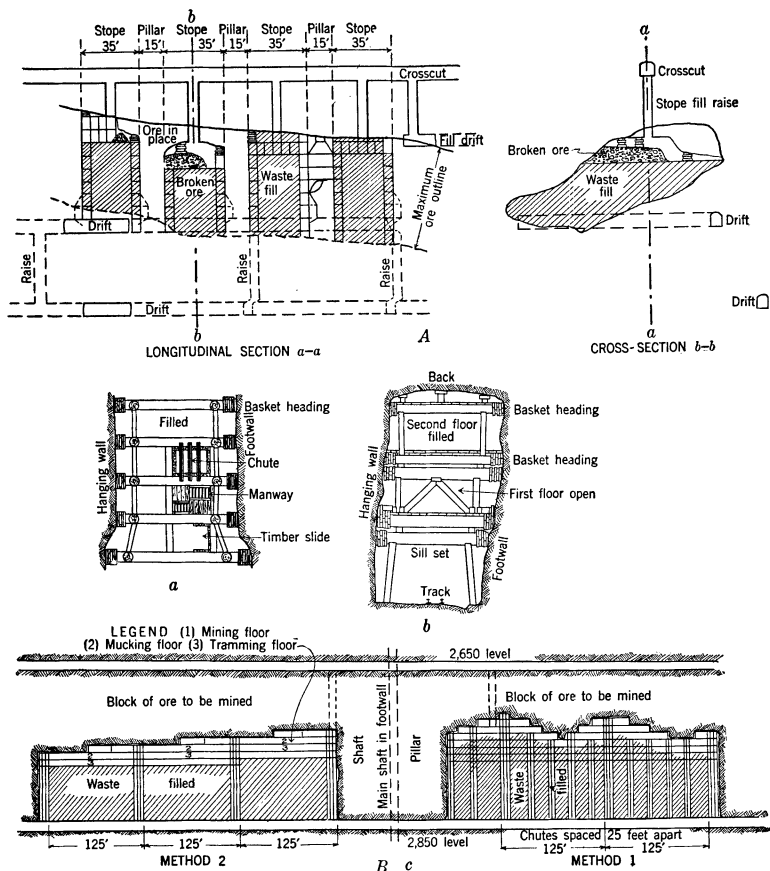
A, Cut-and-fill stoping, employing alternate stopes and pillars, Gilman, Colo. (after Borchardt, Eng. and Min. Jour.); B, stoping with stringer sets and fill, Morning mine: a, Plan of stope timbering; b, elevation of stope timbering; c, generalized longitudinal section through stopes.
